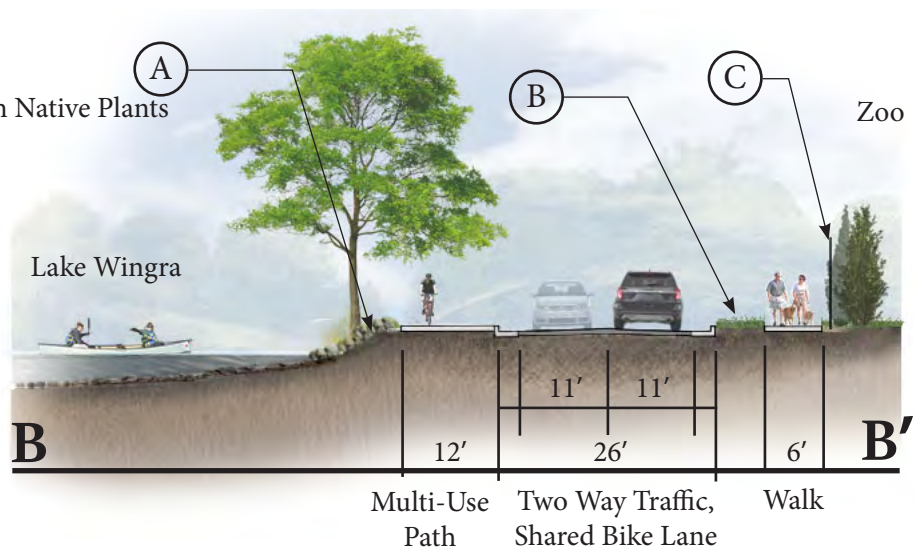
Vilas Park Drive cross-section at section B on plan
